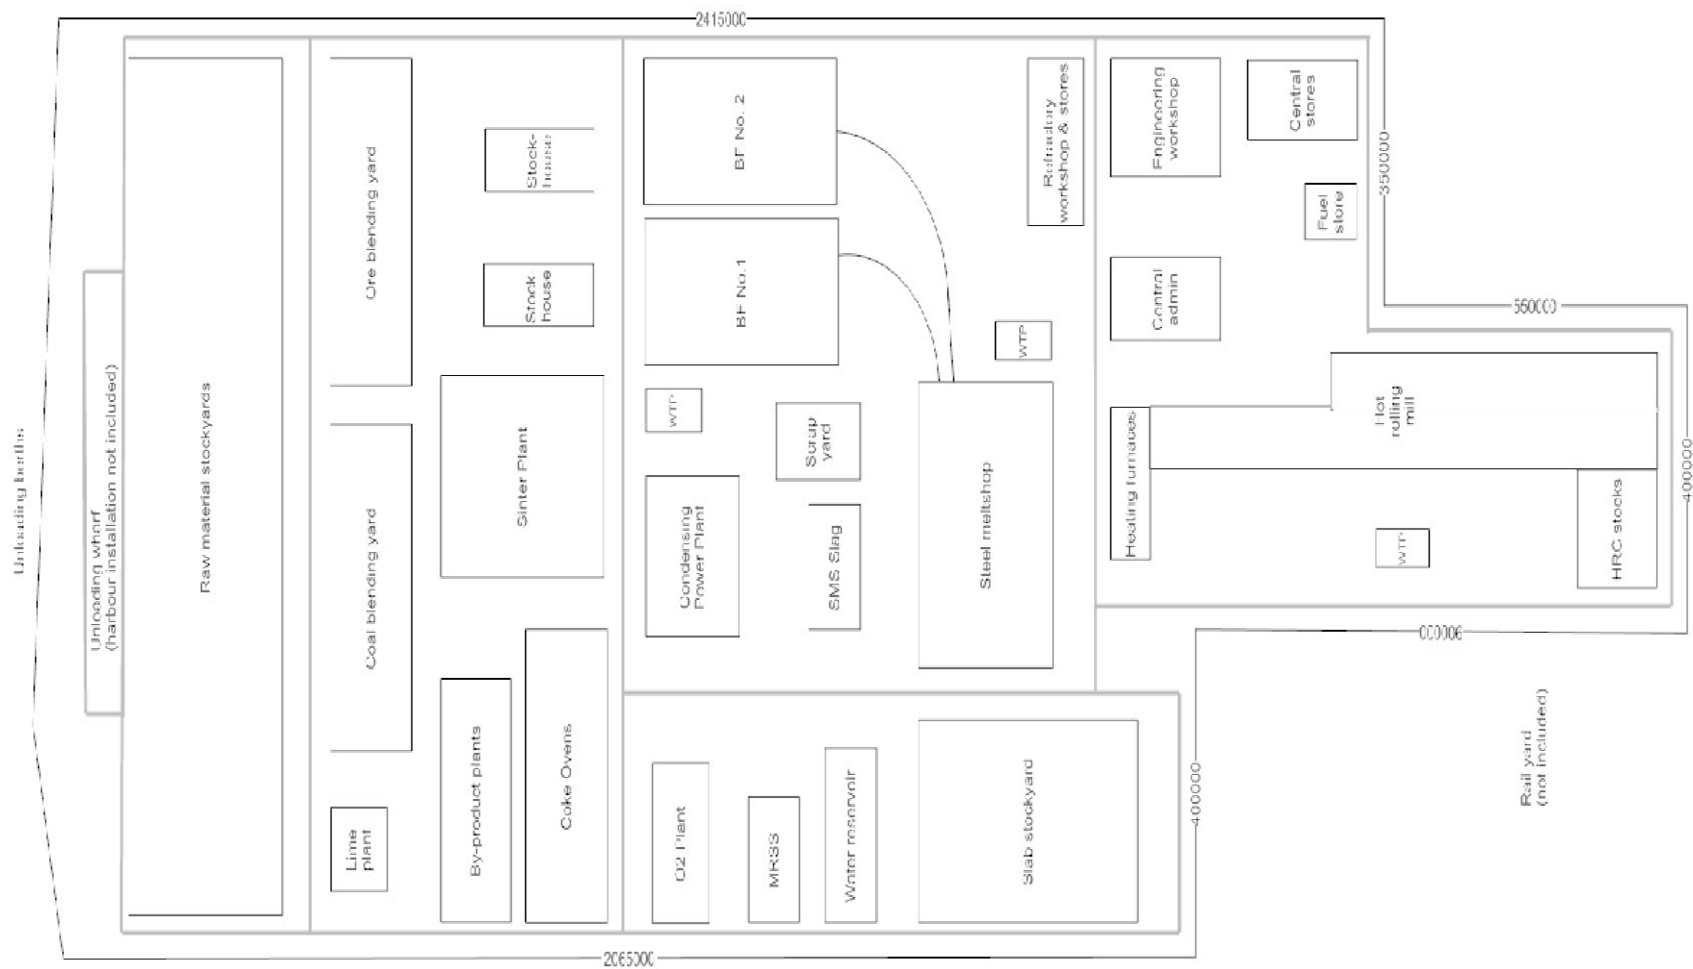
(a): Overview – Plant Layout of the REFERENCE Steel Mill
